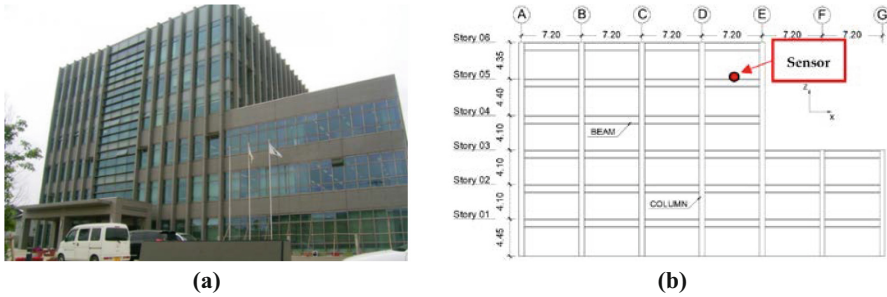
(a) Tahara City Hall building. (b) Elevation drawing view.[4]
